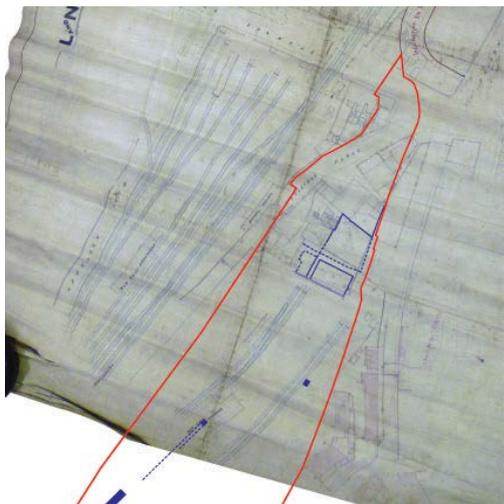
(left): Railway plan, 1884 (CAC(W) TBR 1/3/16/1 1884)
